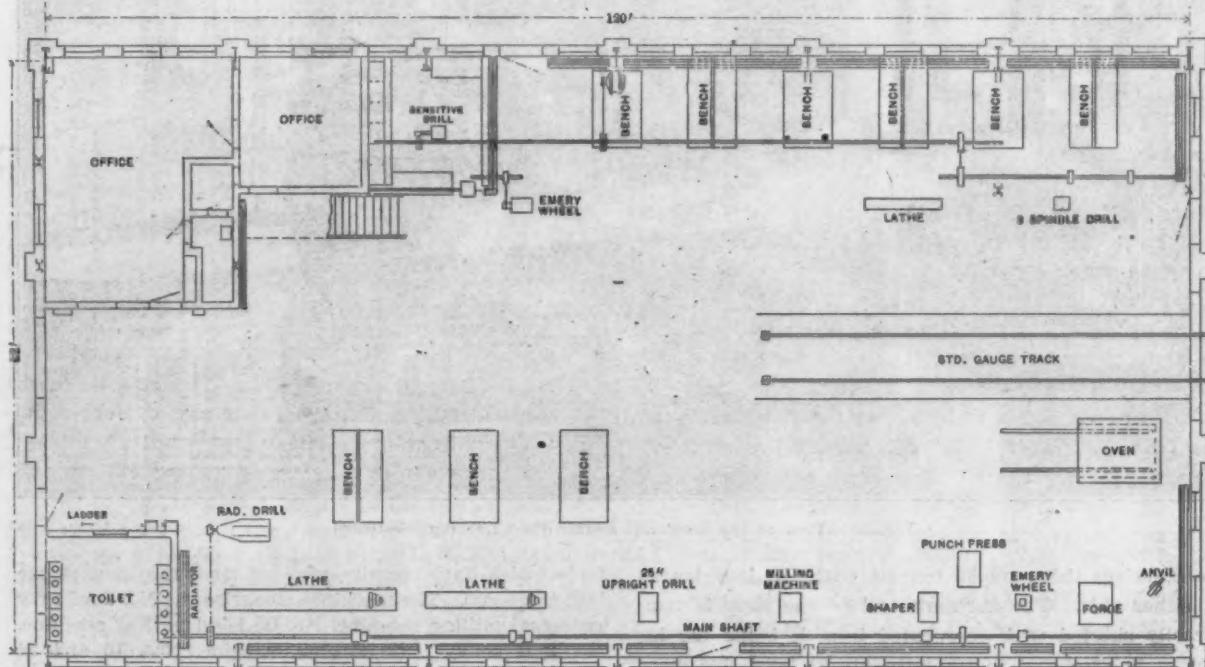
Plan of the Main Floor of the Electrical Repair Shop.
